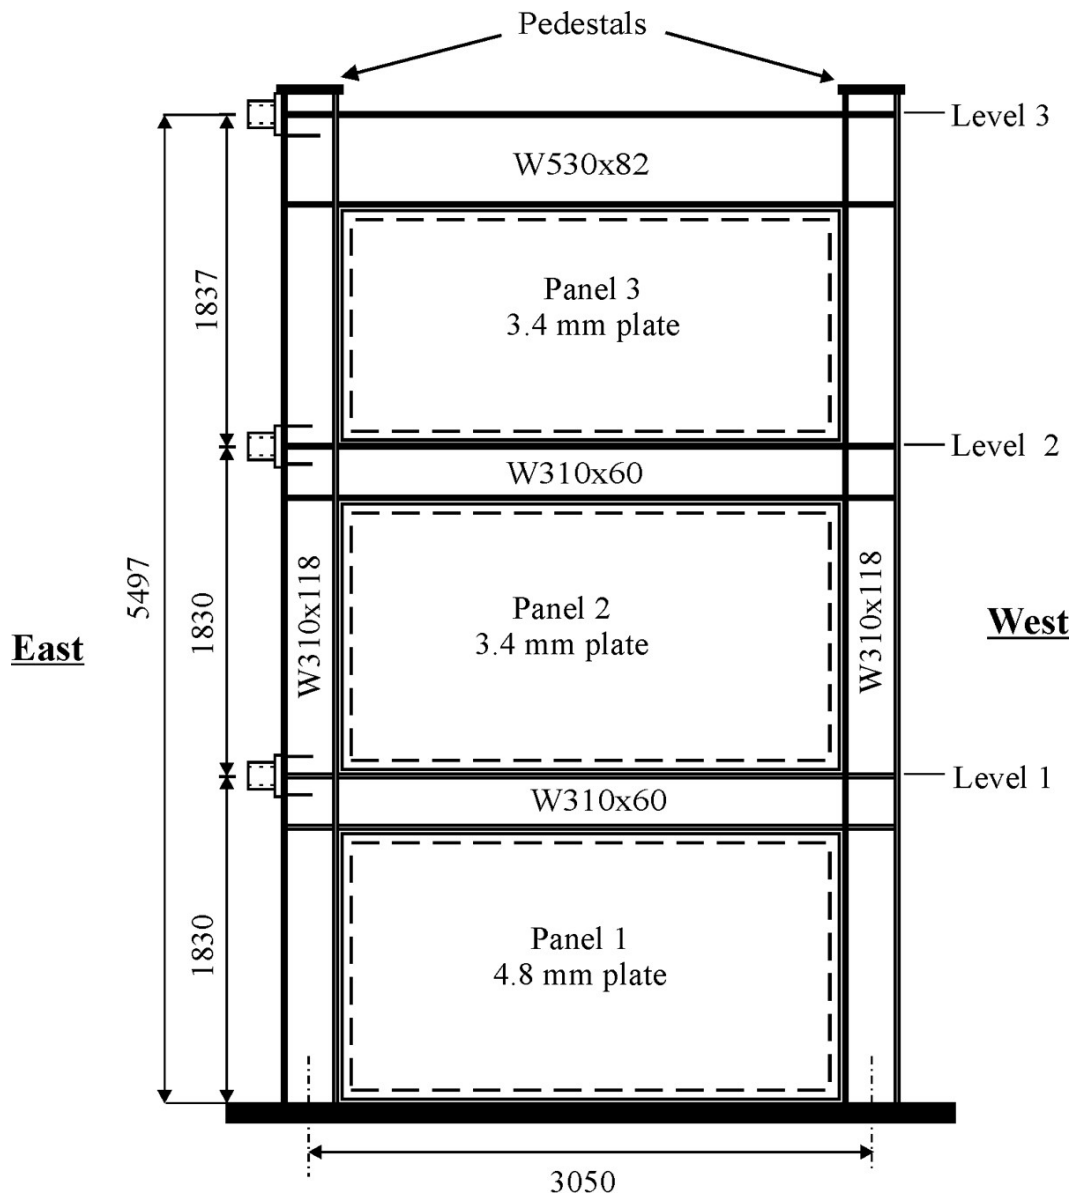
1: Schematic of three-storey steel plate shear wall (Behbahanifard et al., 2003)
